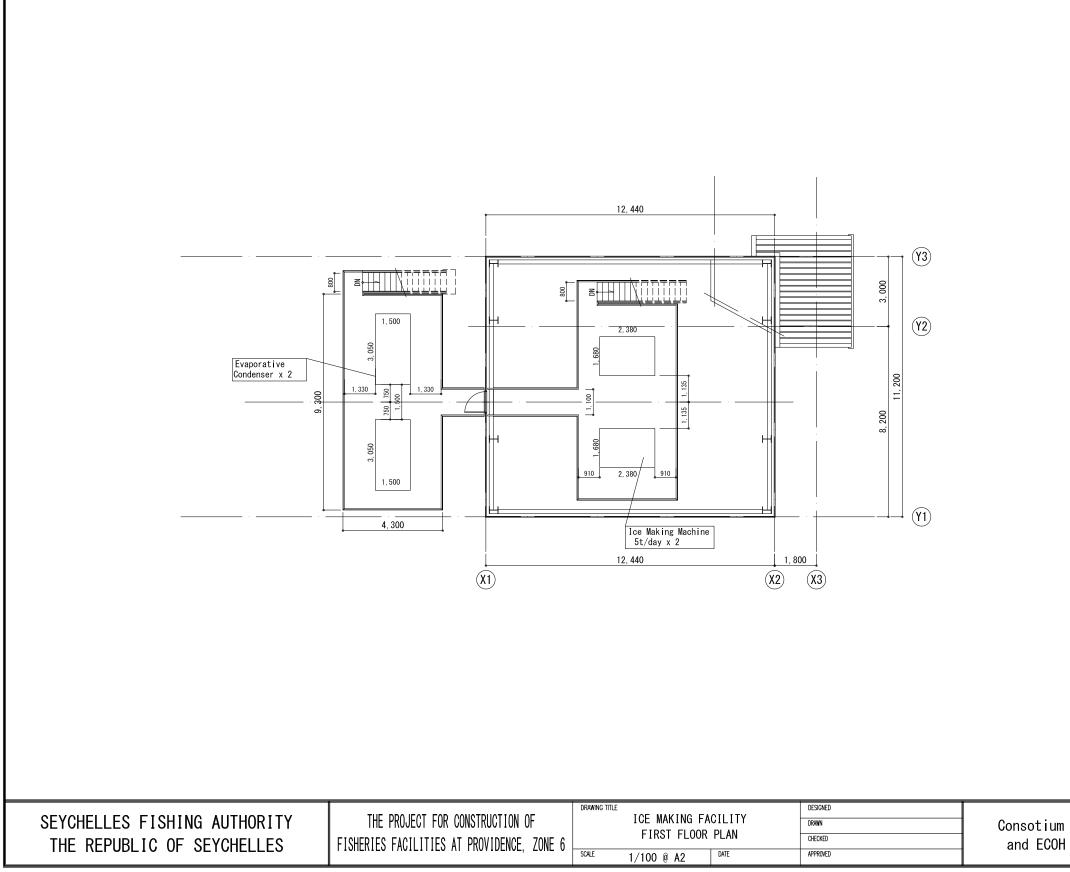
(12) Floor Plan of Ice-making facility 1F
